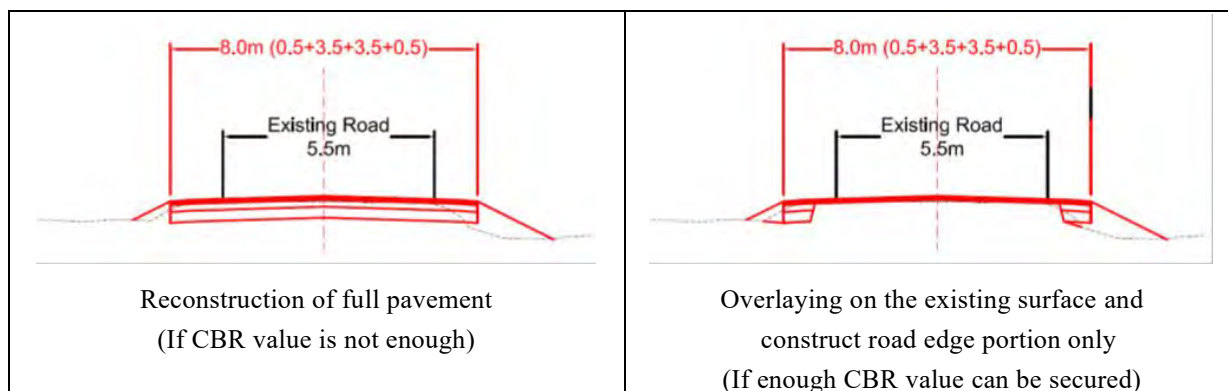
Image of Full Scale Pavement and Partial Pavement
